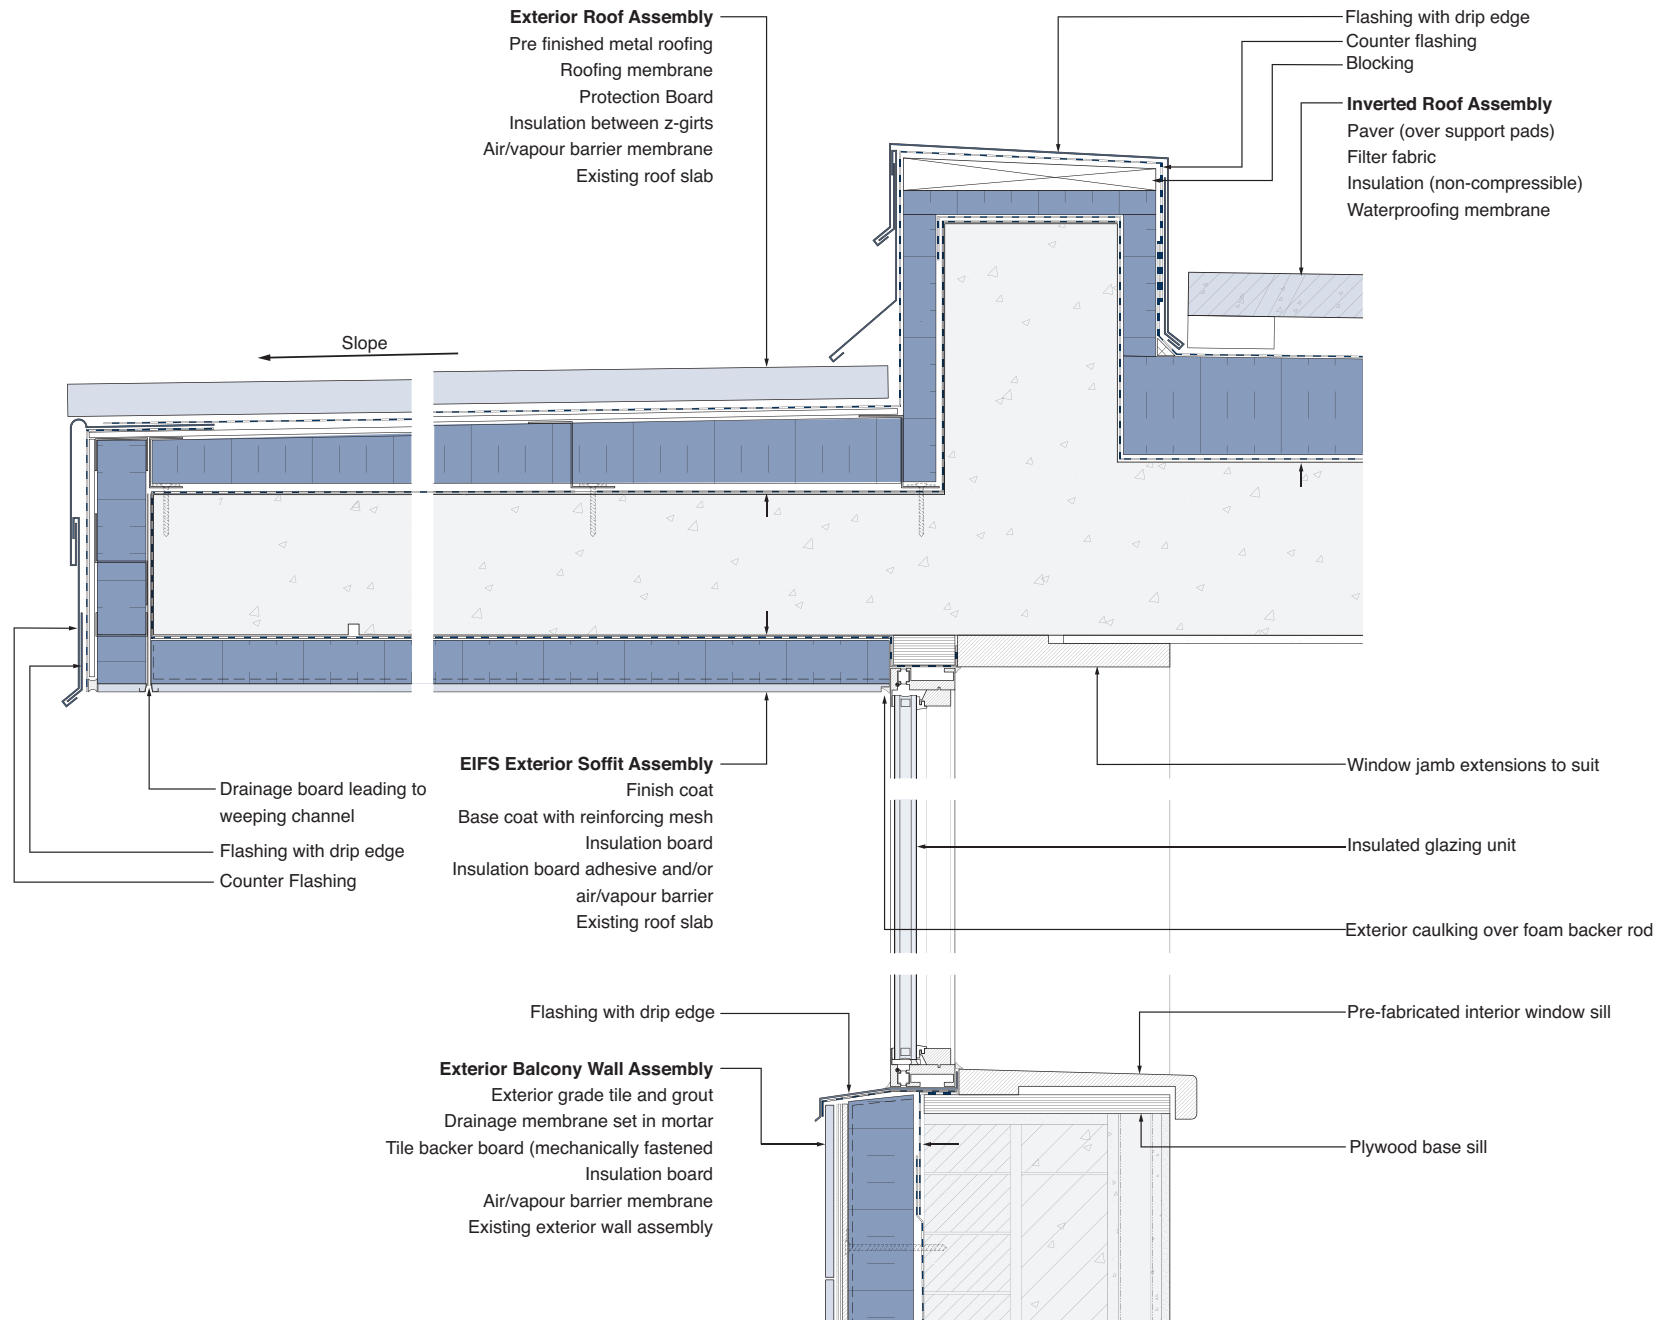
Two roofing systems are depicted in the above detail. An inverted roof system is shown for the main roof area, and a metal roofing system is shown for the cantilevered roof slab. EIFS is applied to the soffit and the balcony wall and window replacement are the same as detailed in the previous section.
